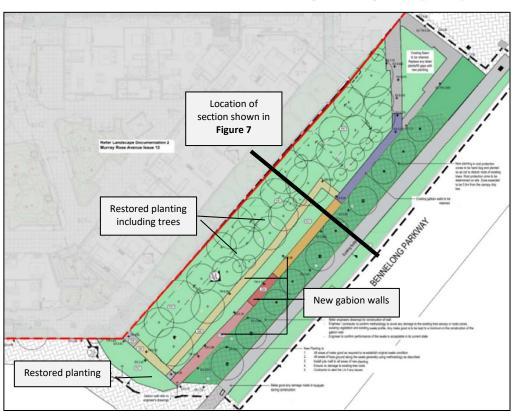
Plan showing the proposed works (Source: Statement of Environmental Effects, prepared by HDC Planning, dated May 2025)
